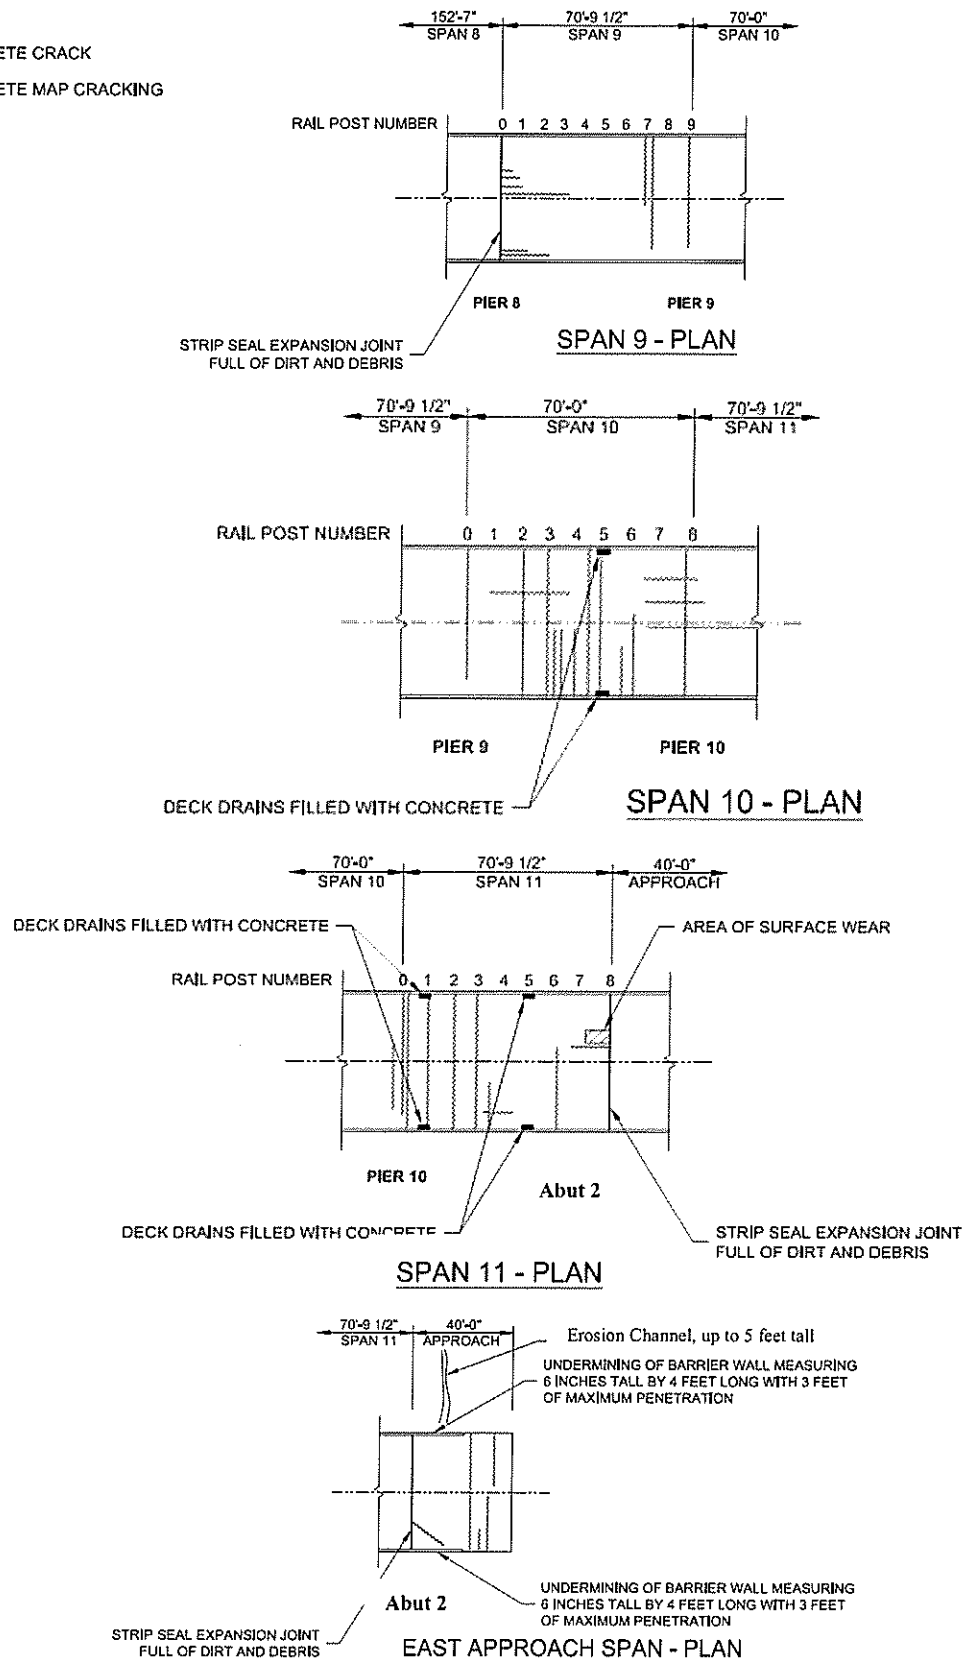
Plan of Deck Defects – Span 9 to East Approach
